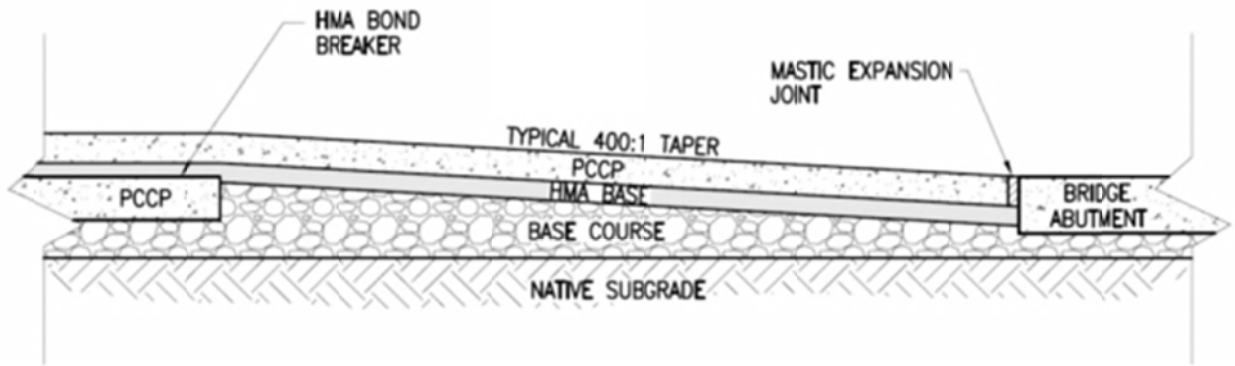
Diagram of transition to bridge approach (unbonded PCC overlay of PCC pavement).
